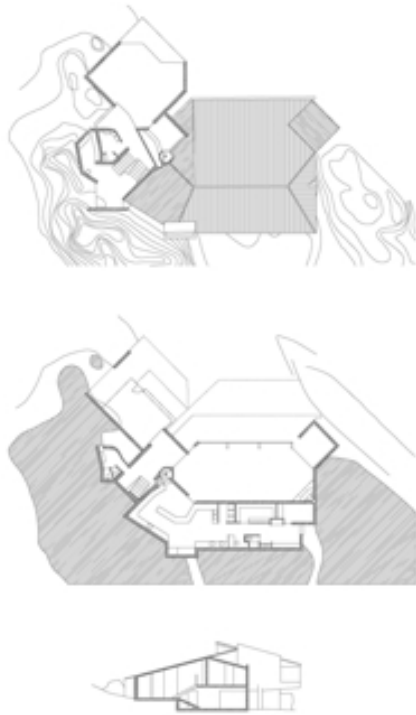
Siza Vieira, Boa Nova Tea House and restaurant, Leça da Palmeira, Portugal, 1958-1963 - section, entry level, restaurant level.
